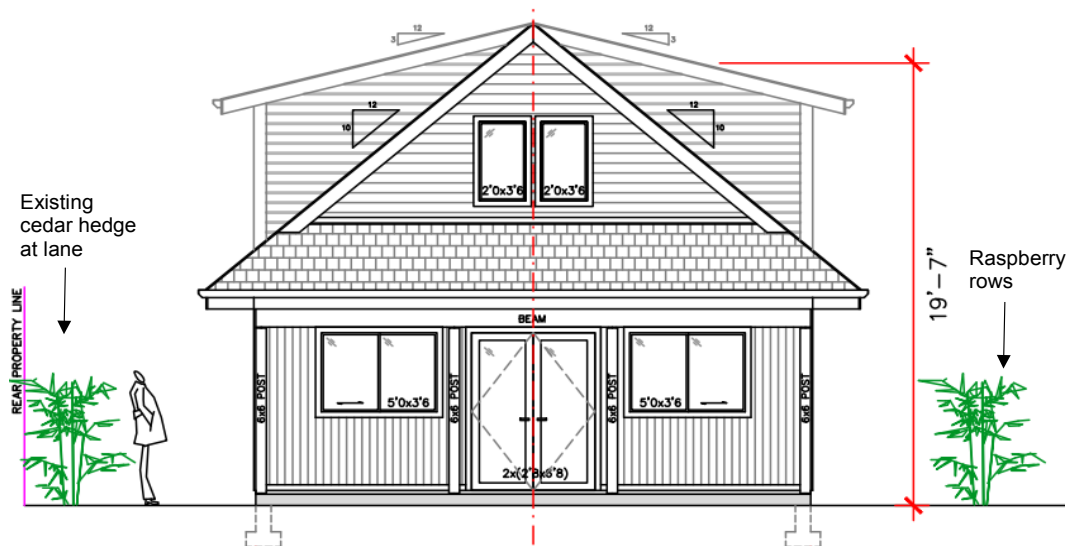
SW Elevation, faces 309 Headlands Road. View from the lane via driveway looks onto the front porch entrance shown.
